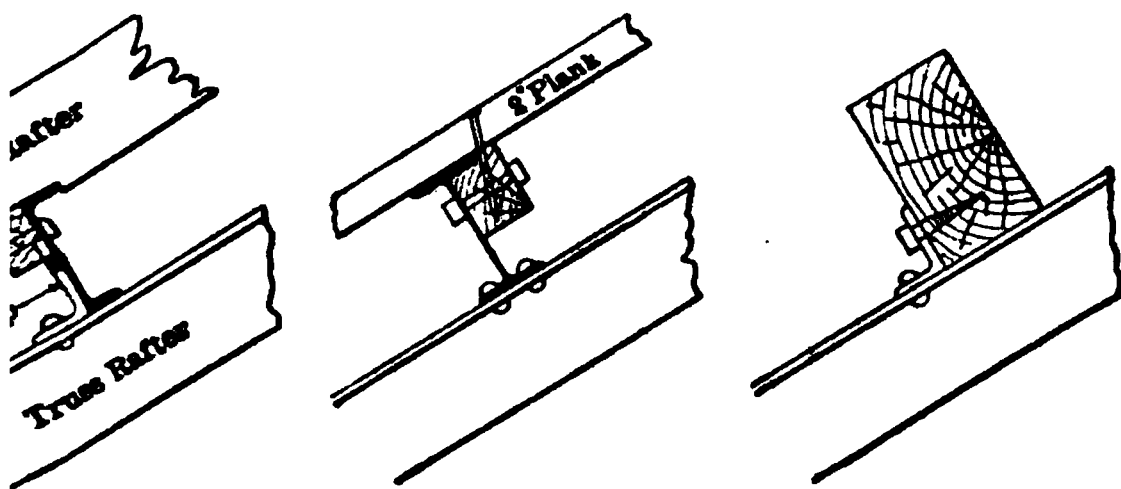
Purlin-connections. Steel Sections with Wooden Nailing-strips
